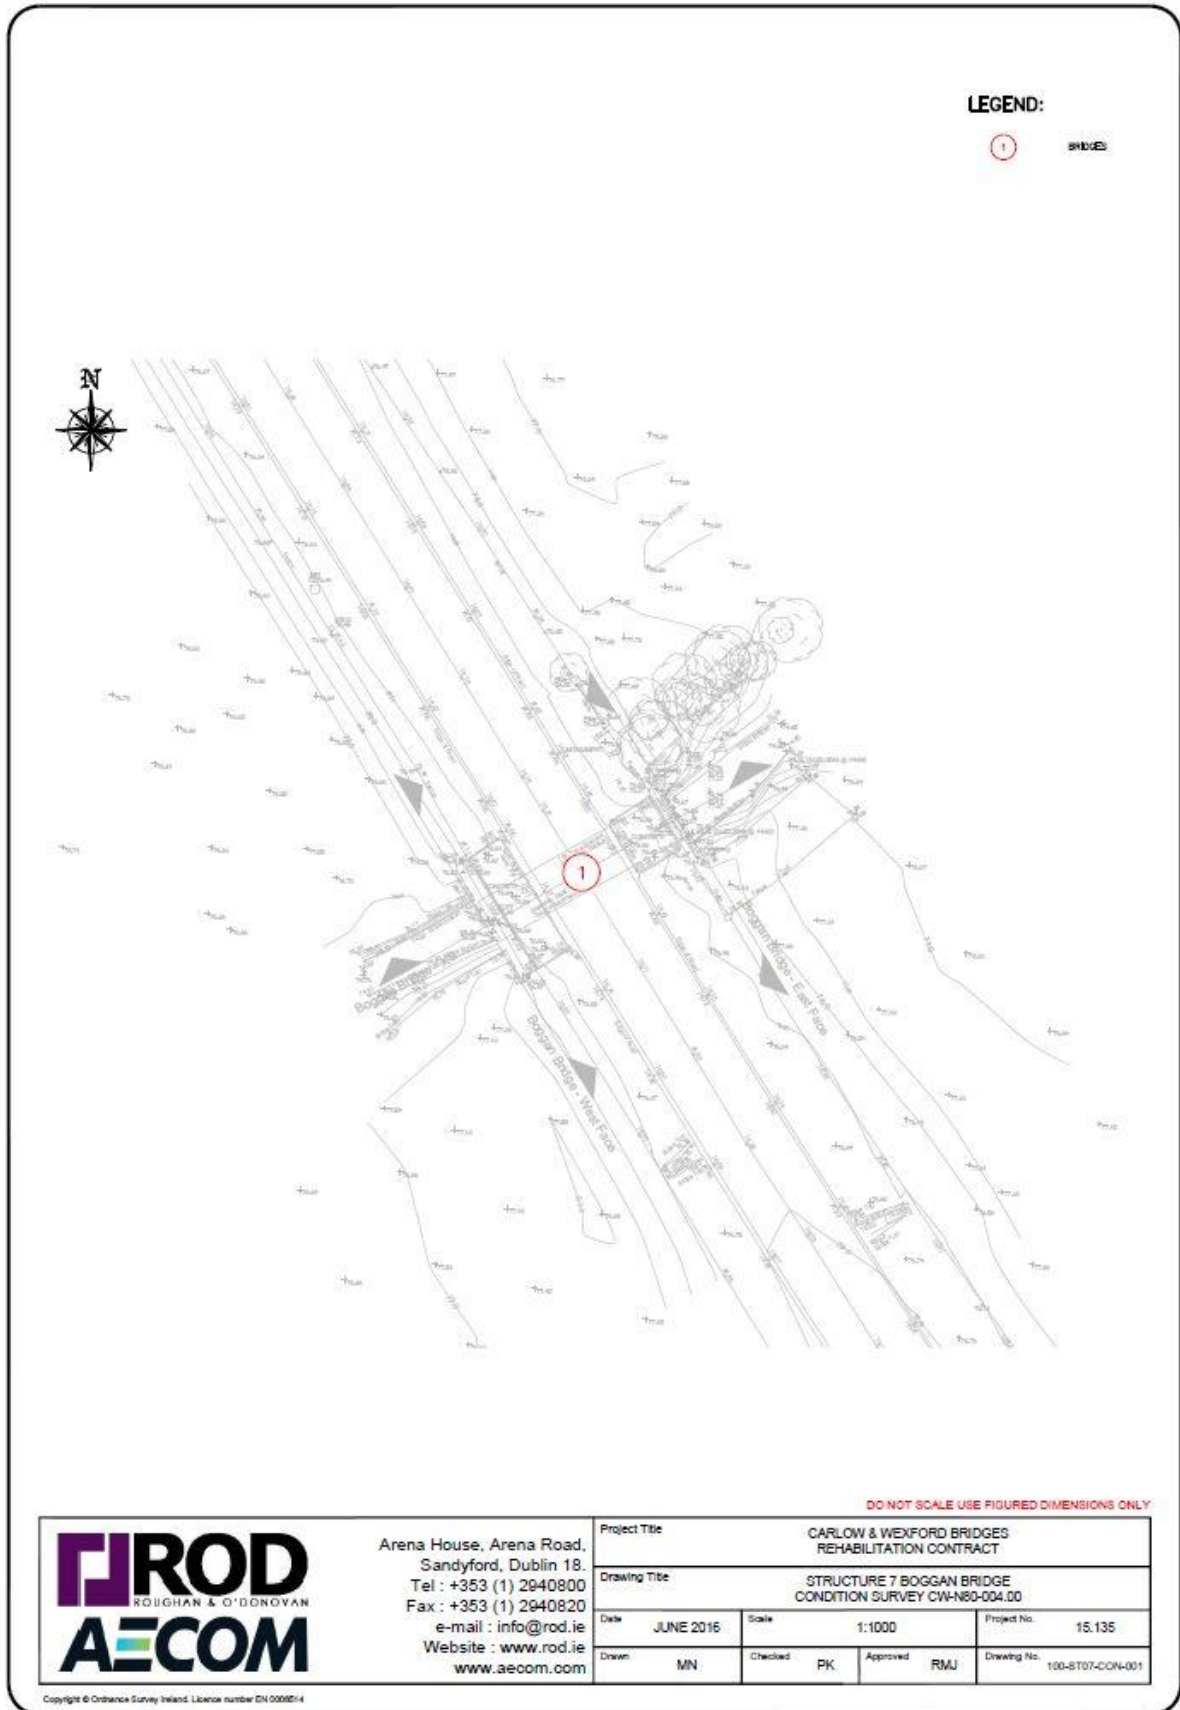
/73/7 Str07 Boggan Bridge CW-N80-004.00
